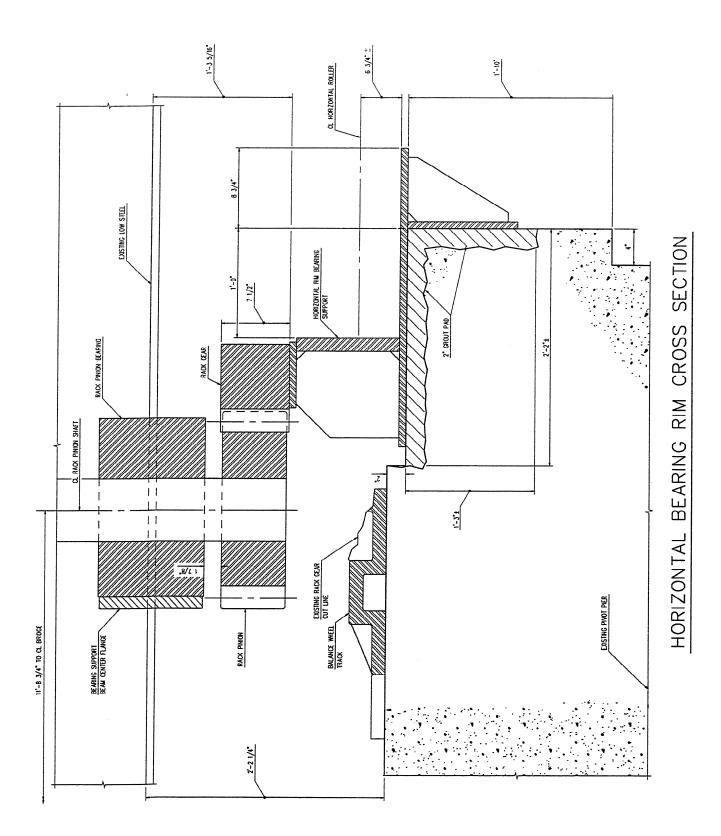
Cross Section View of the Horizontal Bearing Rim, Rack Gear and Rack Pinion
